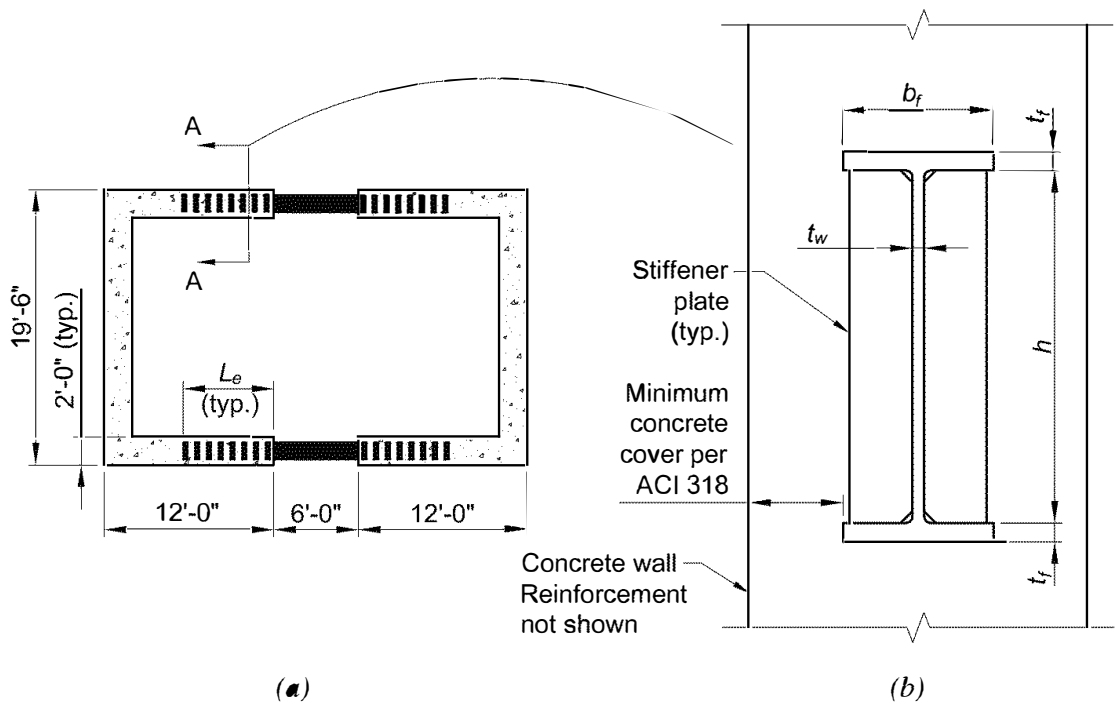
(a) Core plan at sixth floor and (b) Section A-A-beam cross section.
